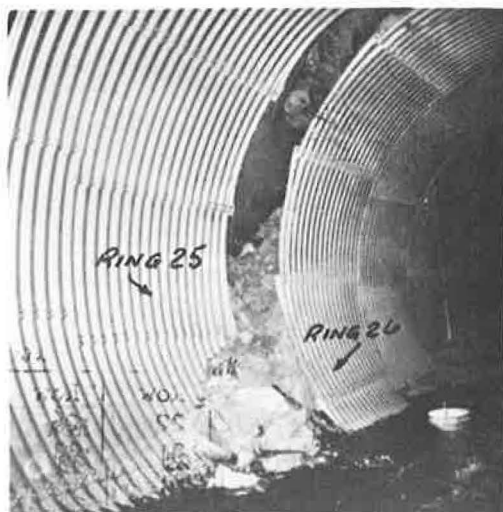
Failure of transverse joint due to differential deformation of adjacent rings.
